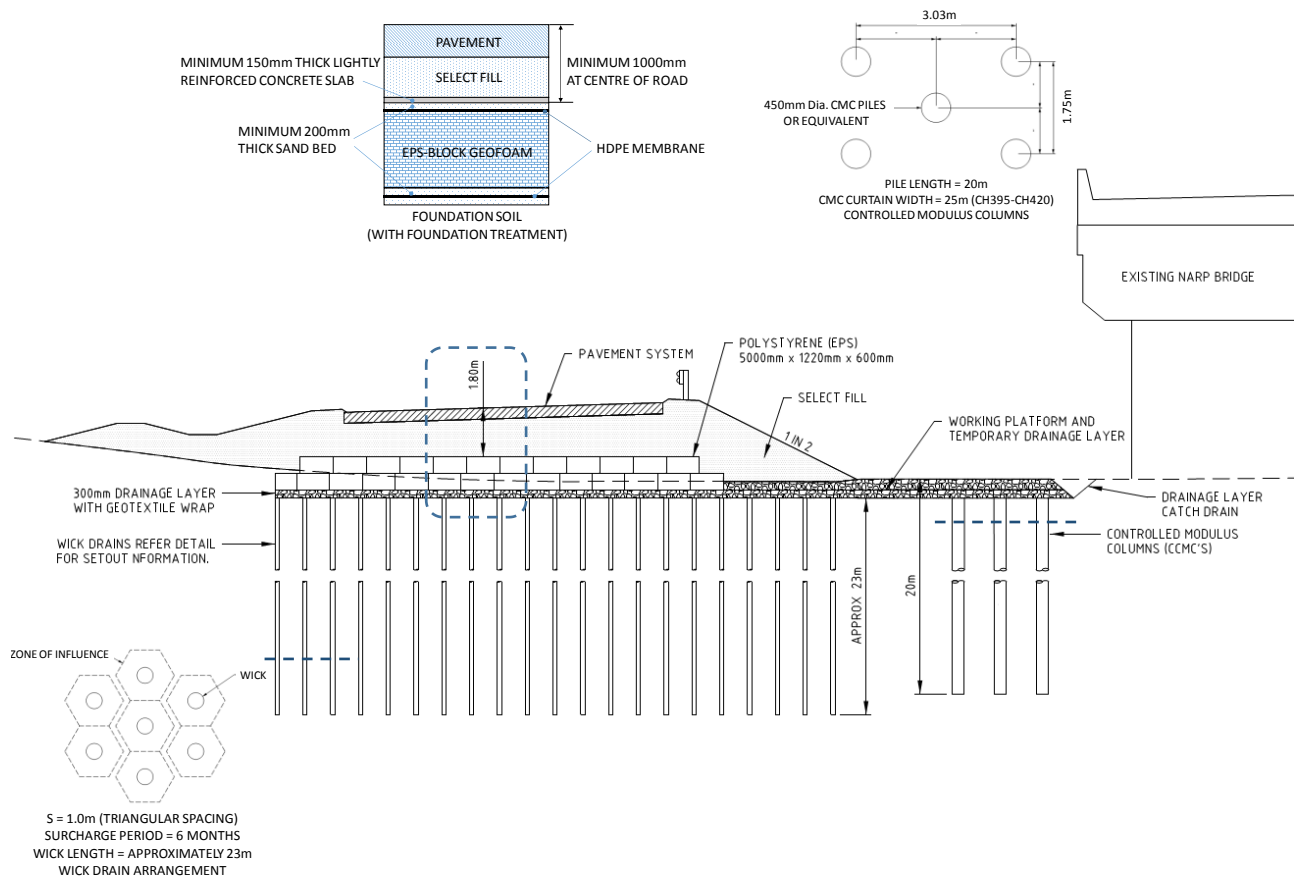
Typical cross section and arrangement of the proposed geofoam embankment.
